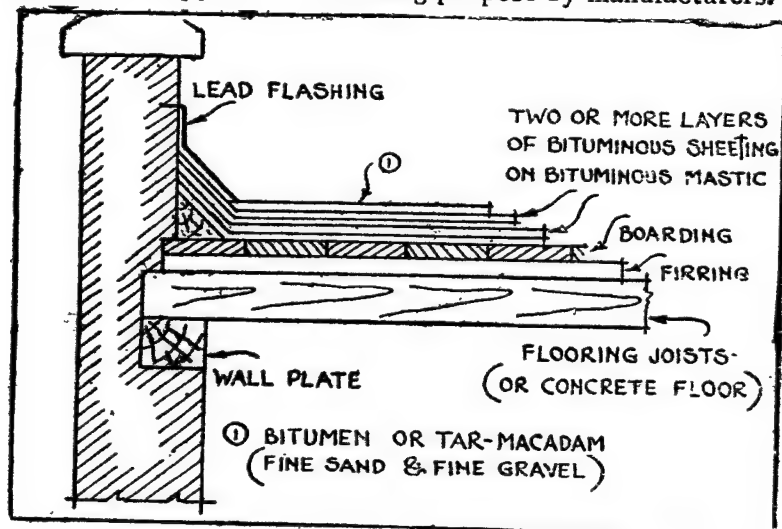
Details of water-proofing with bituminous layers laid on bituminous mastic.
